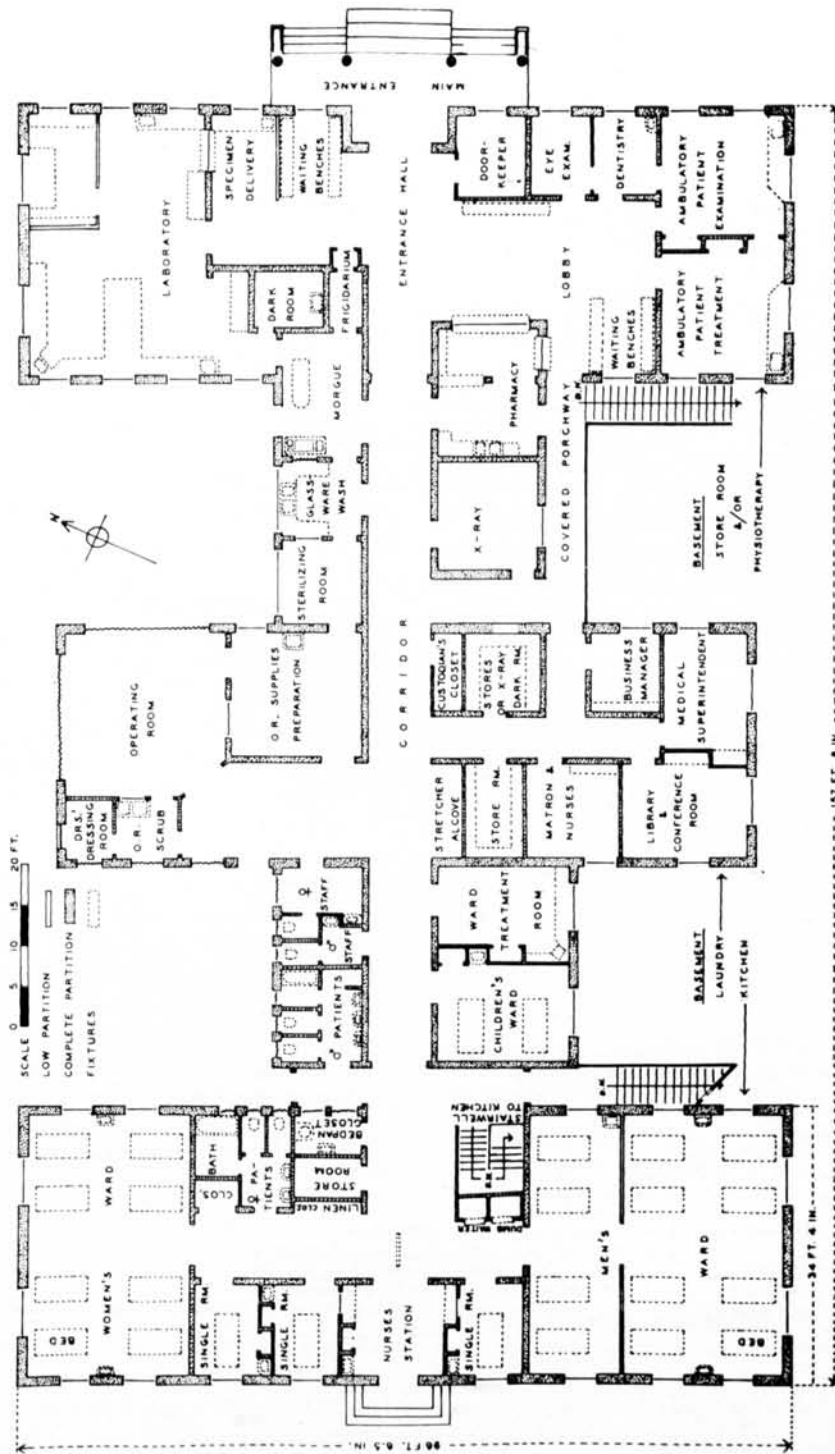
Floor plan, Maxwell Memorial Medical Centre.
